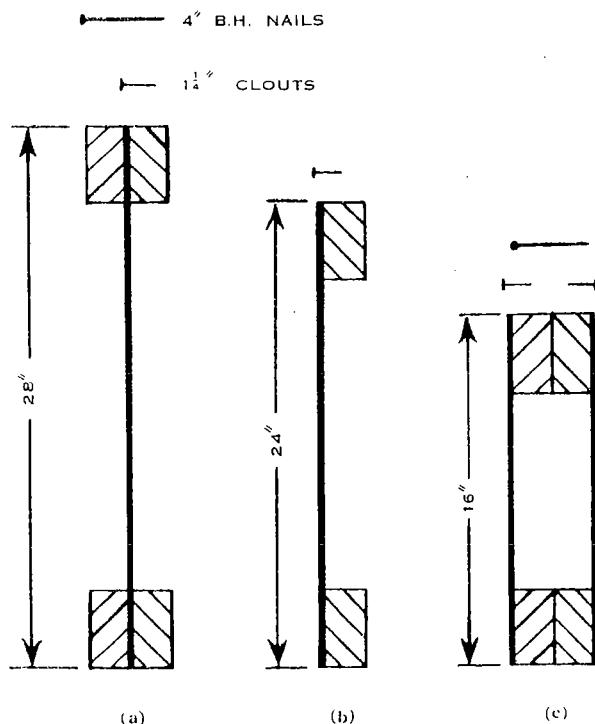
Typical cross section of beams used in mill building. Stiffeners or joints are not shown. All timber was 4 by 2 in. green hardwood. All webs were $\frac{1}{4}$ in. tempered hardboard. (a) 40 ft span beam; (b) 30 ft span beam; (c) beam carrying door.
